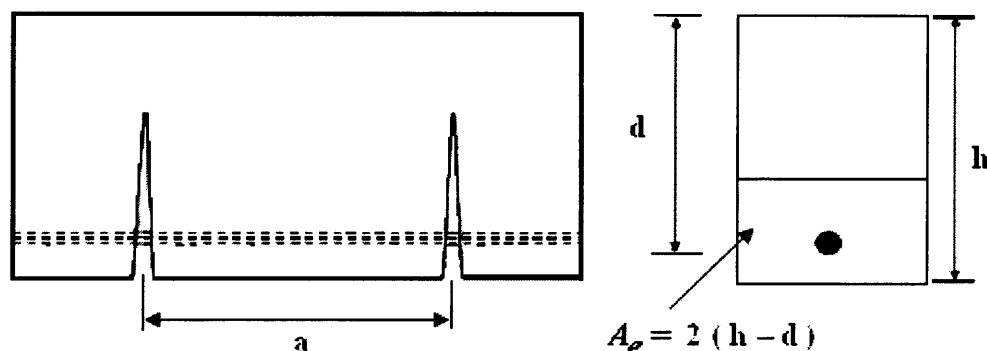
Cracking of a reinforced concrete member under flexure (After Park and Paulay 1975)
